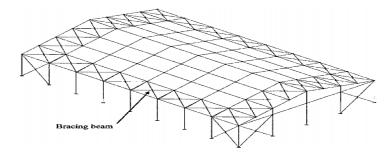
Roof Perimetral Bracing (Martínez et al., 2004)
